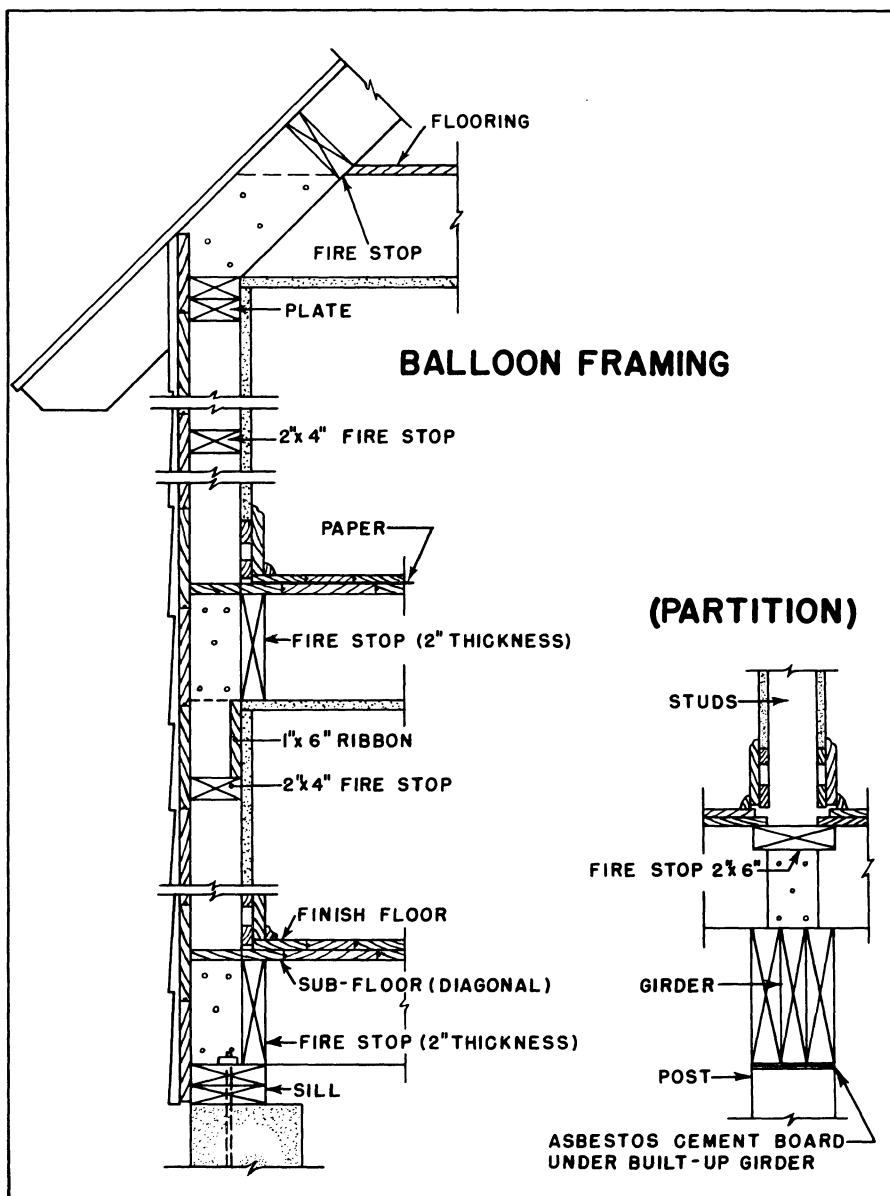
Wooden blocks can be used to provide fire-stopping in houses with balloon framing.
